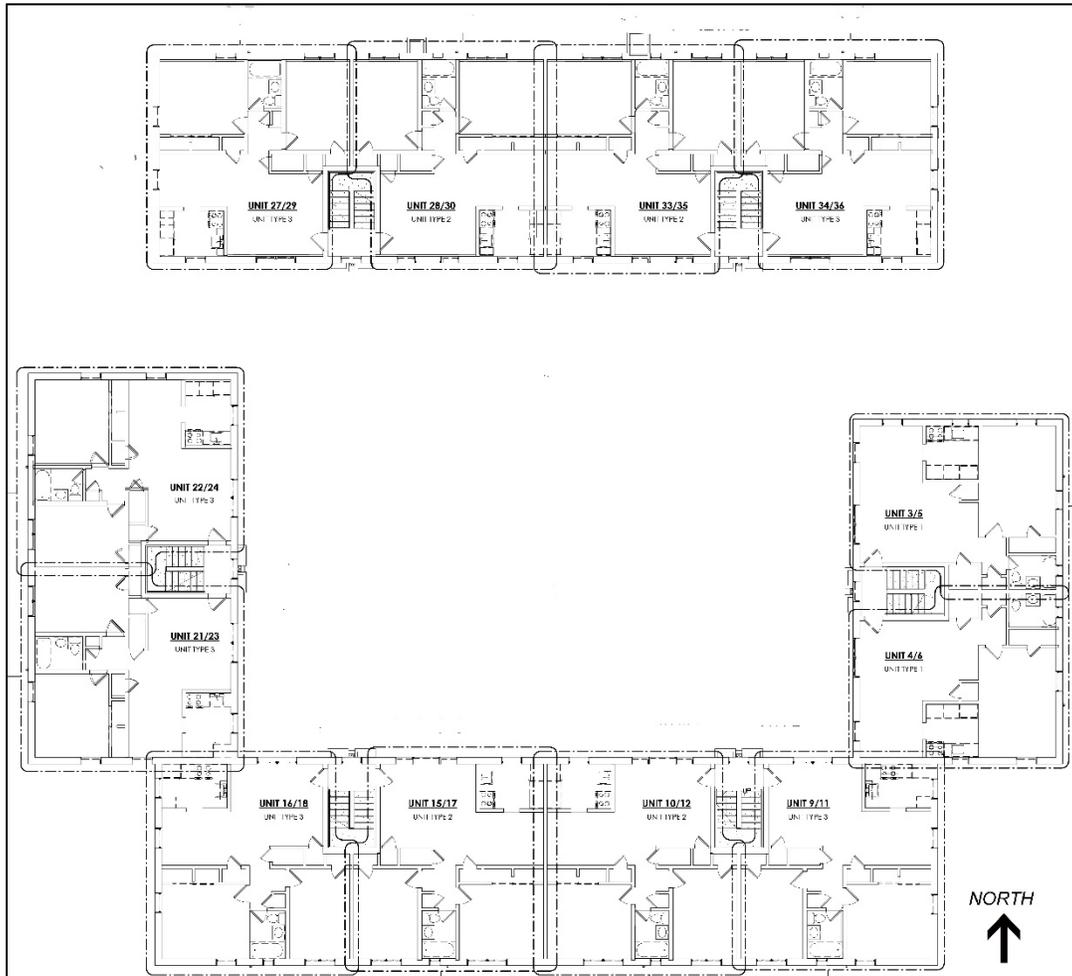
Representative Interior Floor Plan, Current showing that historic floor-plans are largely intact
